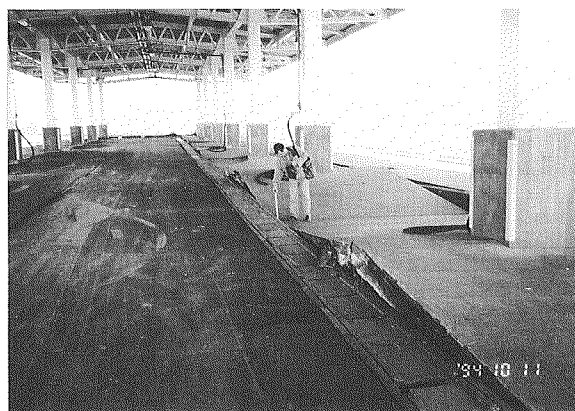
Damage to quay surface by liquefaction at Hanasaki Port
